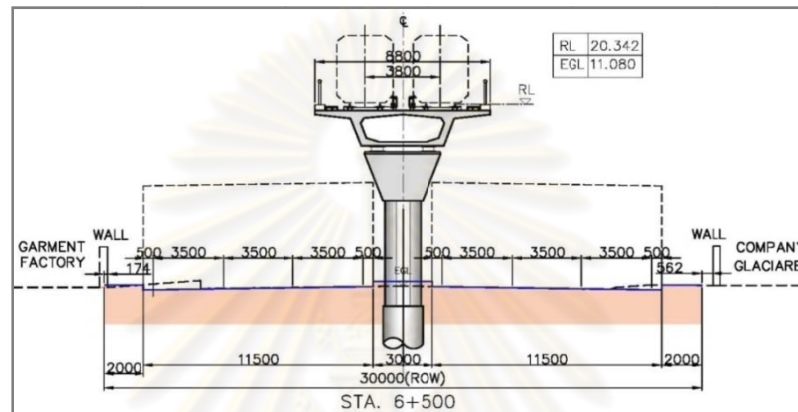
Sky Rail Cross Section on Russian Boulevard (JETRO, 2008)
